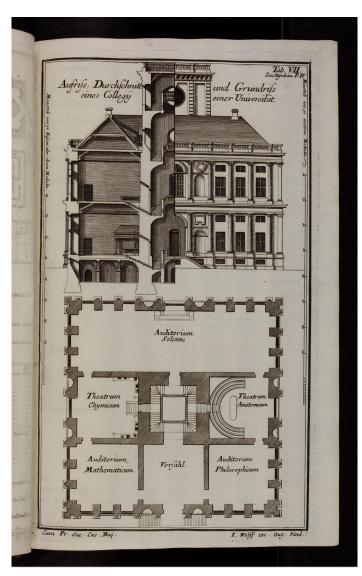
Floor plan and section of an exemplary university building with anatomical theatre according to Leonhard Christoph Sturm.
